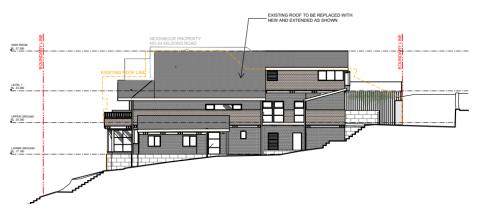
East elevation. The yellow dashed line shows where the building has been set back further (closer to the original profile of the building), and where the roof has been extended at the rear, an area which does not impact on the primary presentation of the building.
